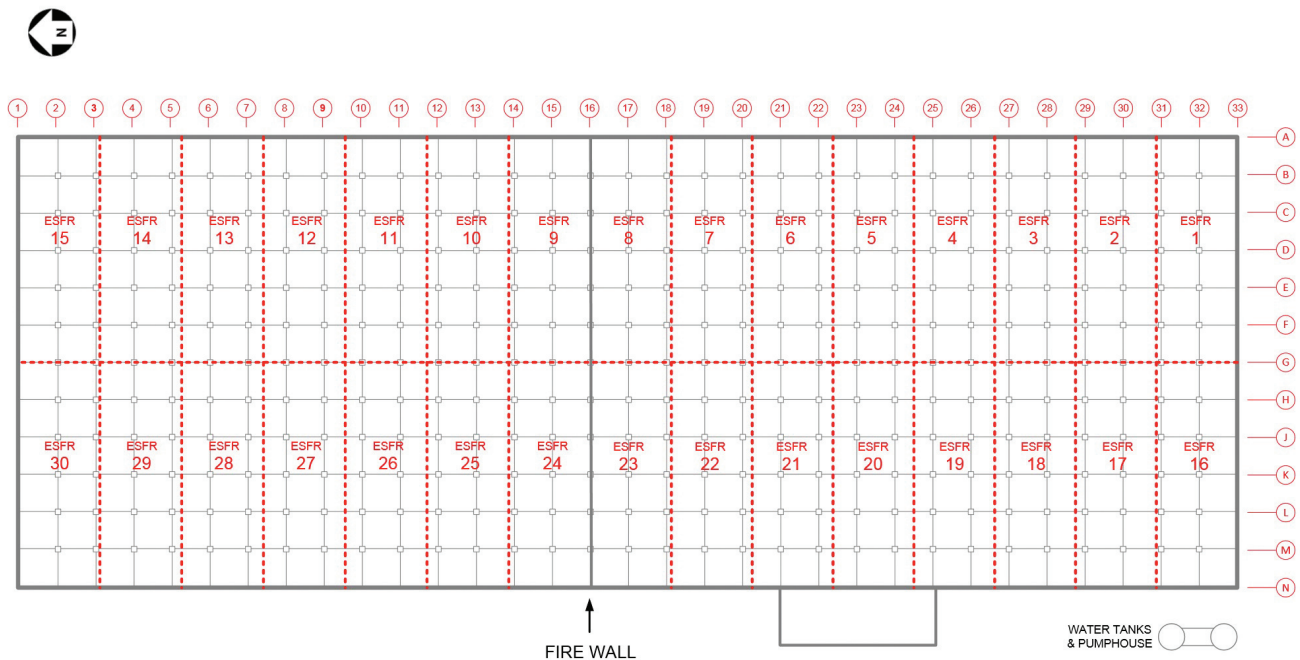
ESFR risers 1 to 15 were located on the east side of the building, while risers 16 to 30 were on the west side.
